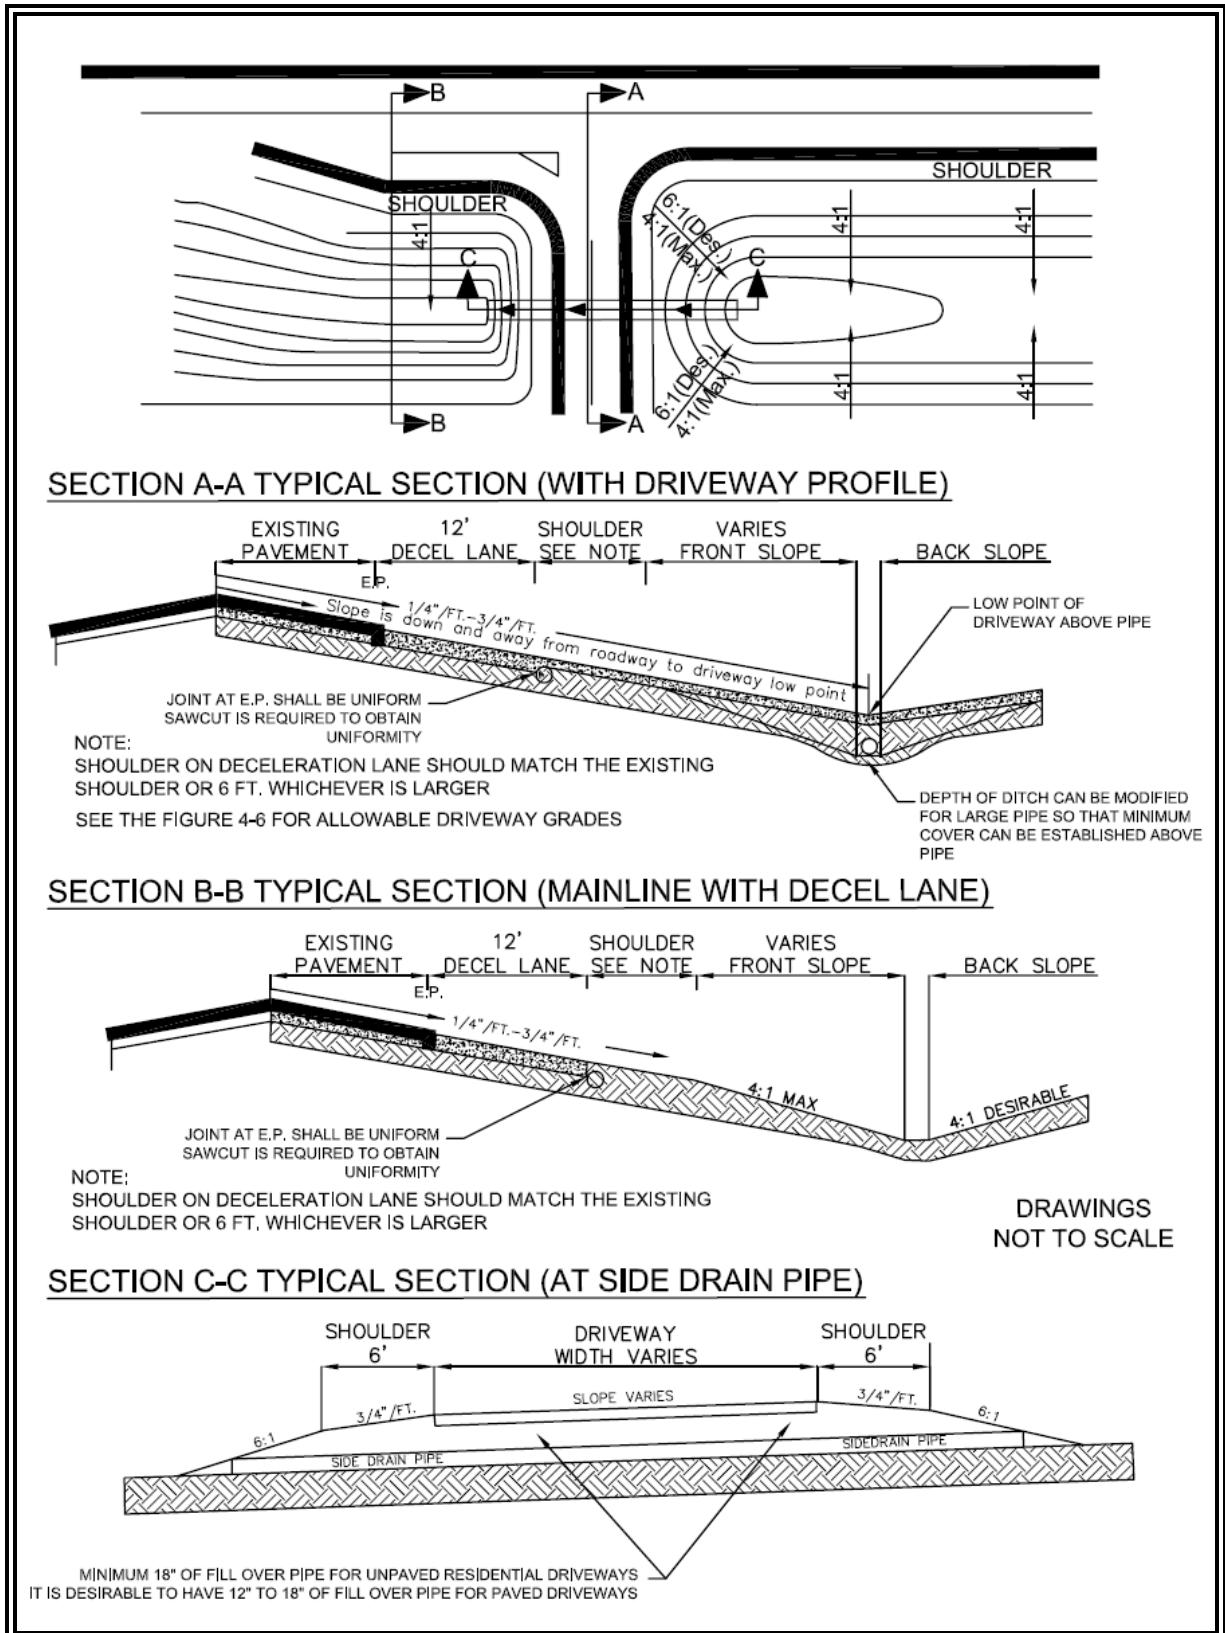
DRIVEWAY CONNECTION TO RURAL ROADWAYS
